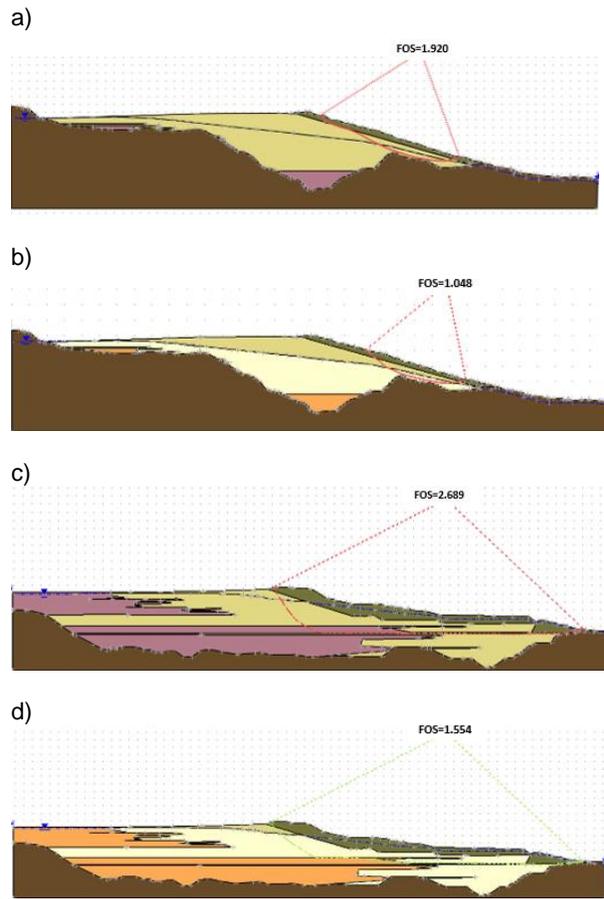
Shear section: a) cross section AA, drained condition; b) cross section AA, undrained condition; c) cross section 01, drained condition; d) cross section 01, undrained condition.
